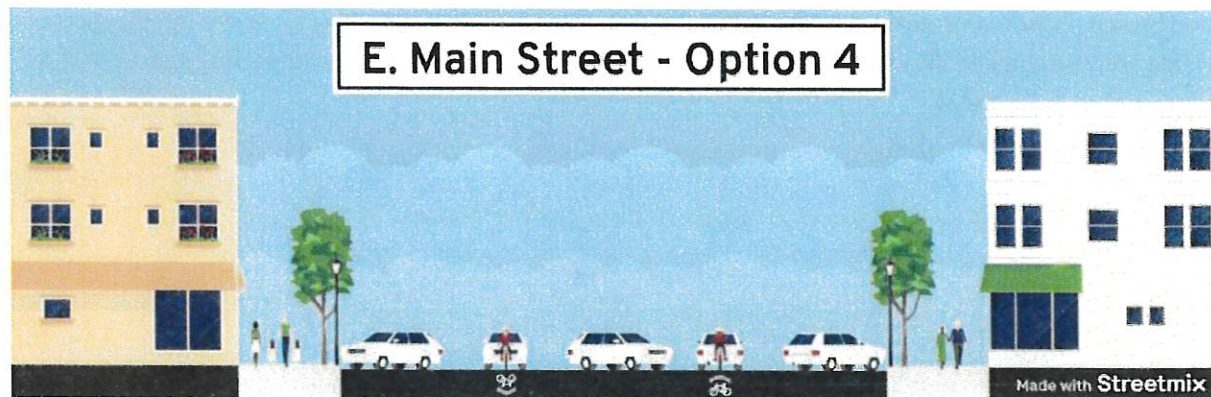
Downtown Streetscape Alternate Layout - Option 4
